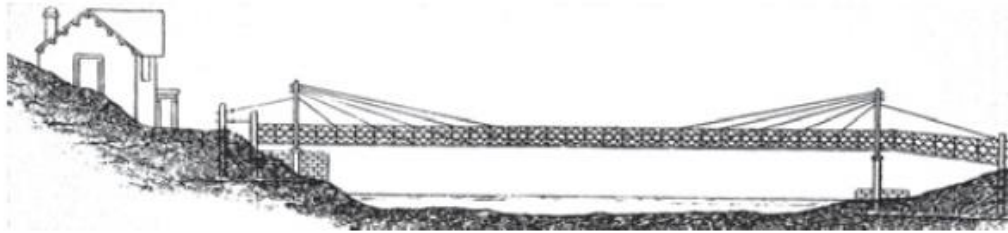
Kings Meadow Bridge, 1817 (Svensson, 2012)
